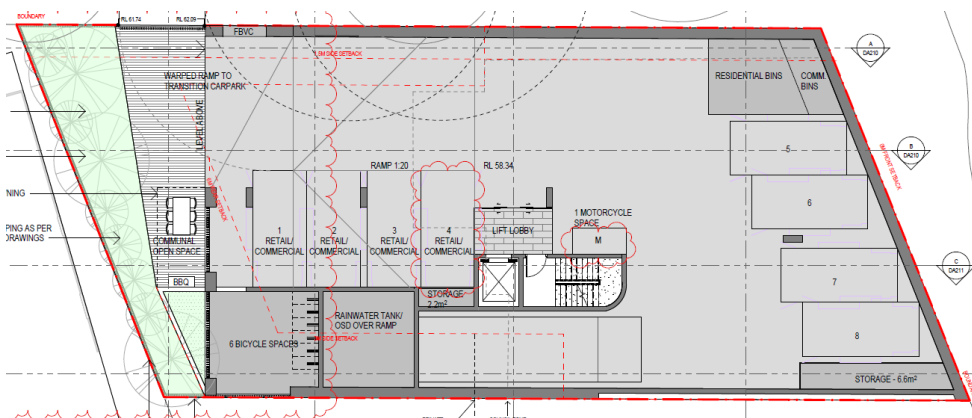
Proposed basement 1 floor plan - 18-20A Perouse Road, Randwick (Source: Curzon & Partners)
